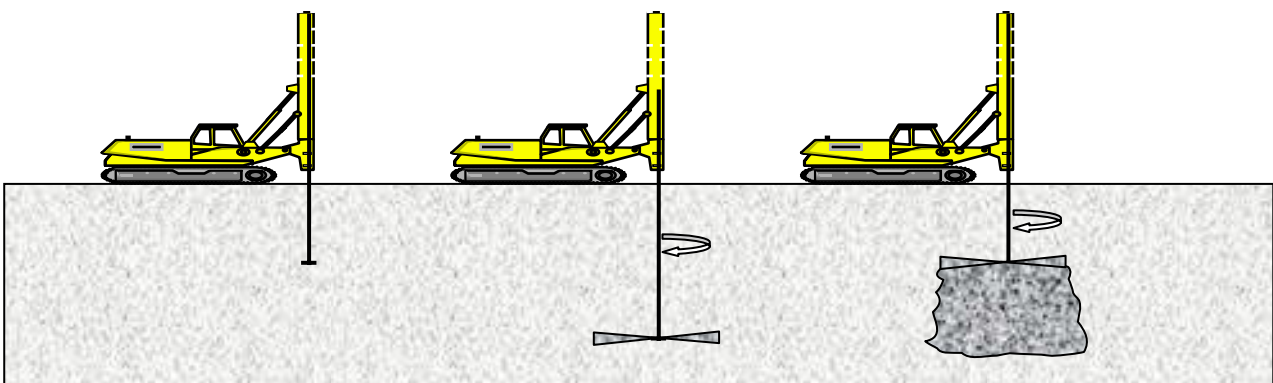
JGP construction stages (Hewitt *et al.*, 2006).
